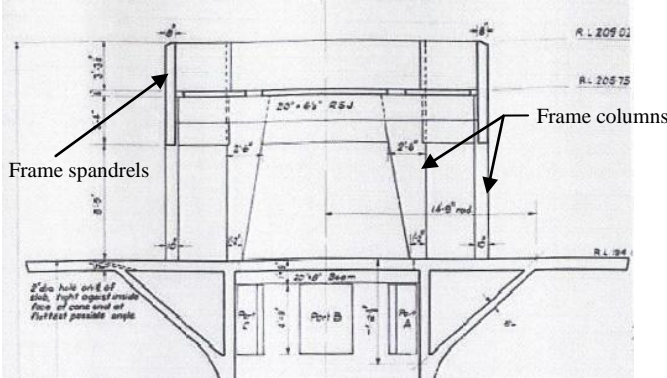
Cross section of service level slab and cab reinforced concrete frame
